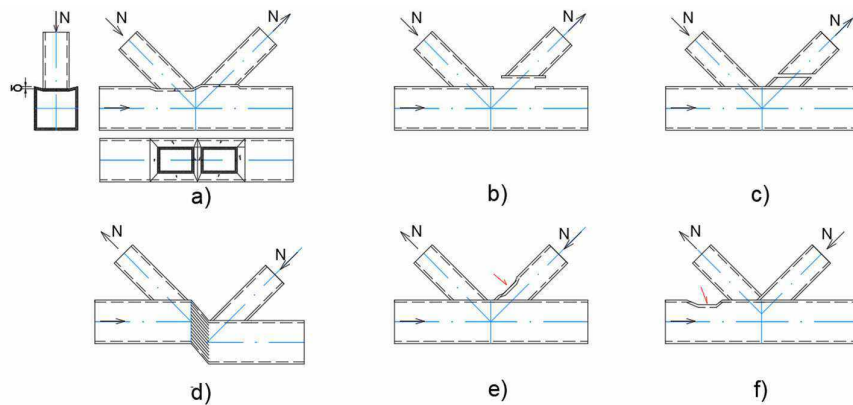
Failure Modes in Truss Joints [21]
